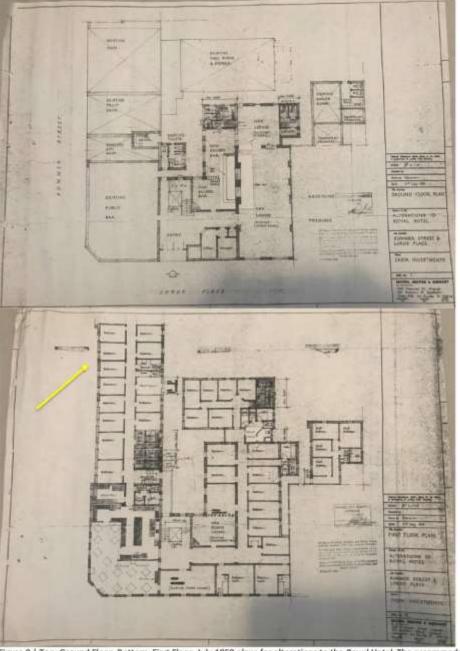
| Top: Ground Floor. Bottom: First Floor. July 1959 plans for alterations to the Royal Hotel. The accommodation across the first floor of the Buildings is a traditional use. The Lords Place lot had been sold. [Orange City Council]
